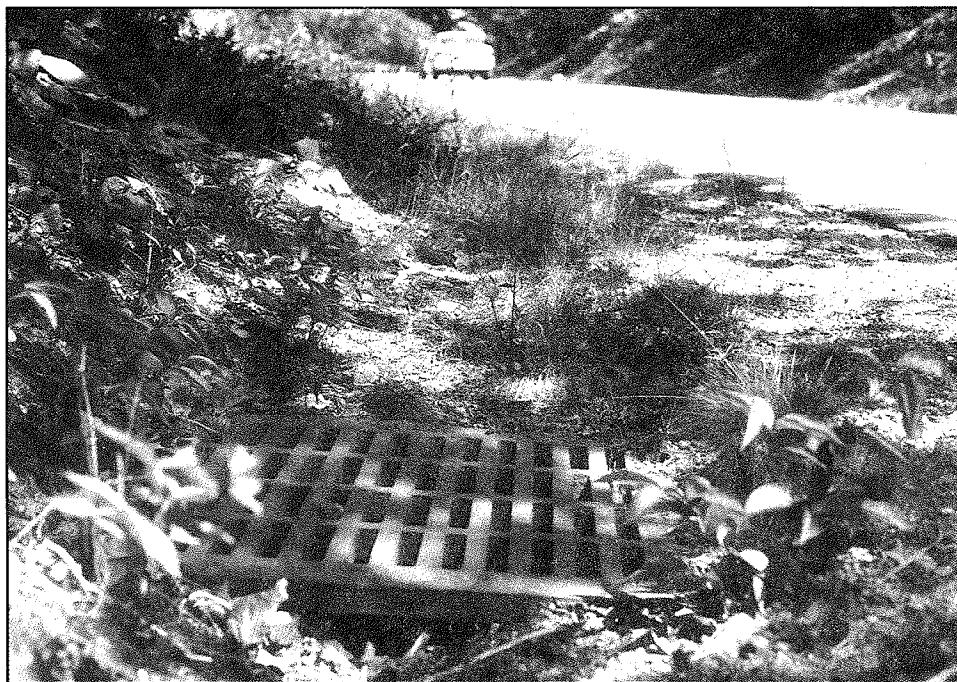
A post-1940 concrete drop inlet, station 70+00, Paradise Hill Road, 1993. Photograph by OCLP.
